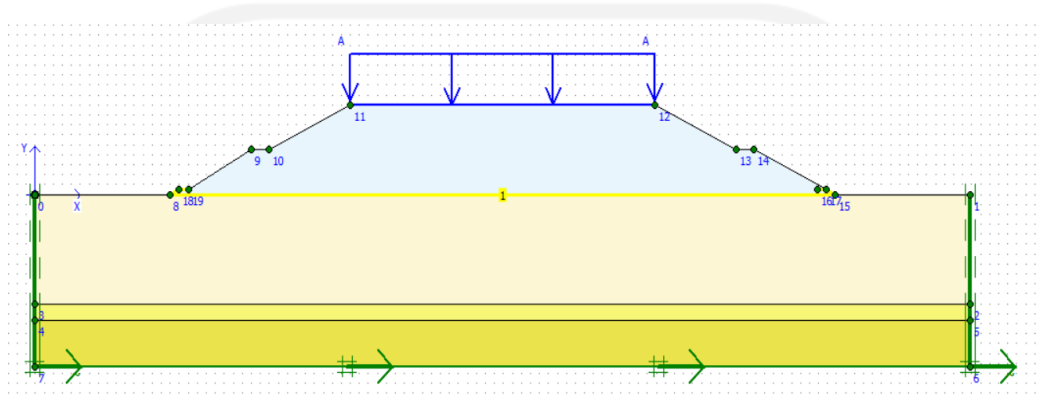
Modelling of Embankment 1 Trap with Geotextile Reinforcement
